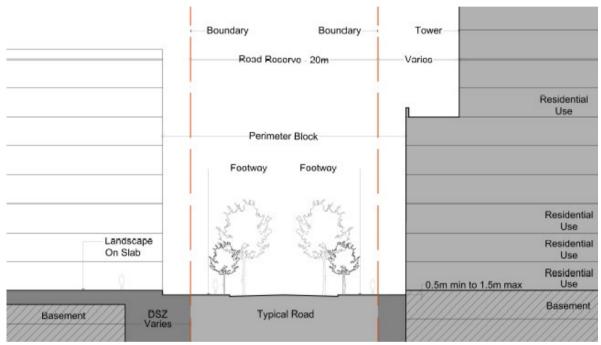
Courtyard Basement - Interface with Street
